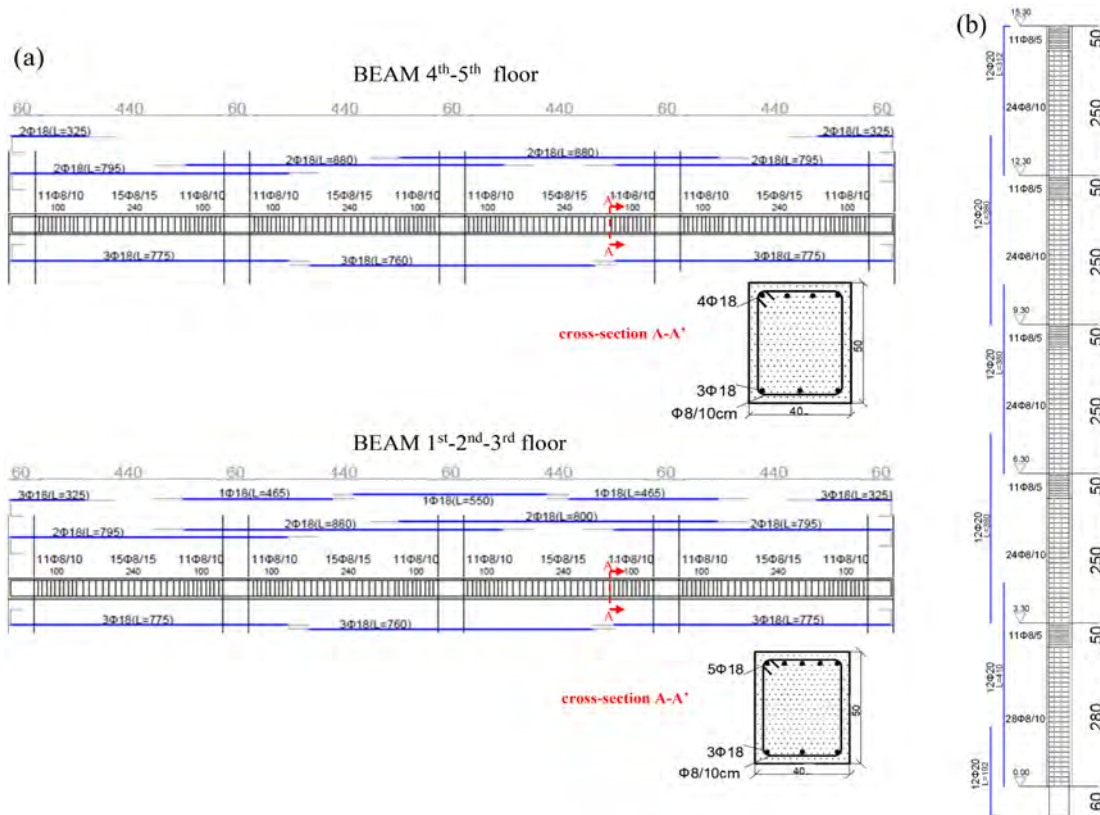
Longitudinal and transverse reinforcement arrangement for: (a) beams with the cross-sections; (b) columns. Measurements in cm. Indication of position of two cross sections in the beams.
